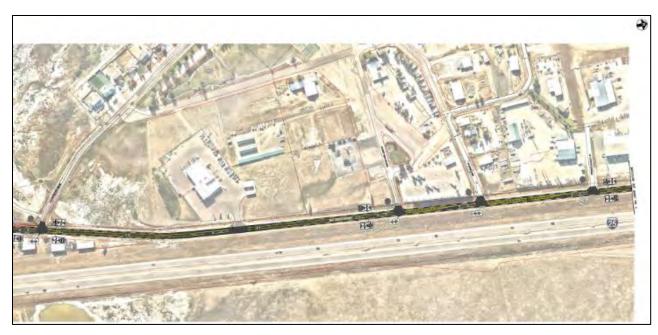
CONCEPT #6 - CROSS-SECTION IMPROVEMENTS WITH SHARED USE PATH, SHEET 1
